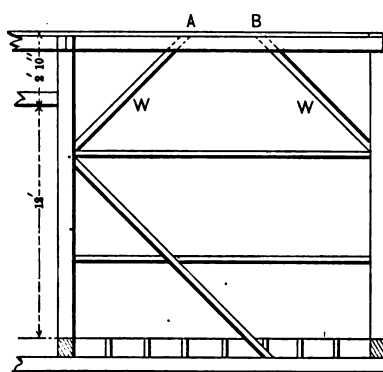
Partial Elevation.—Scale, $\frac{1}{4}$ Inch to the Foot.
